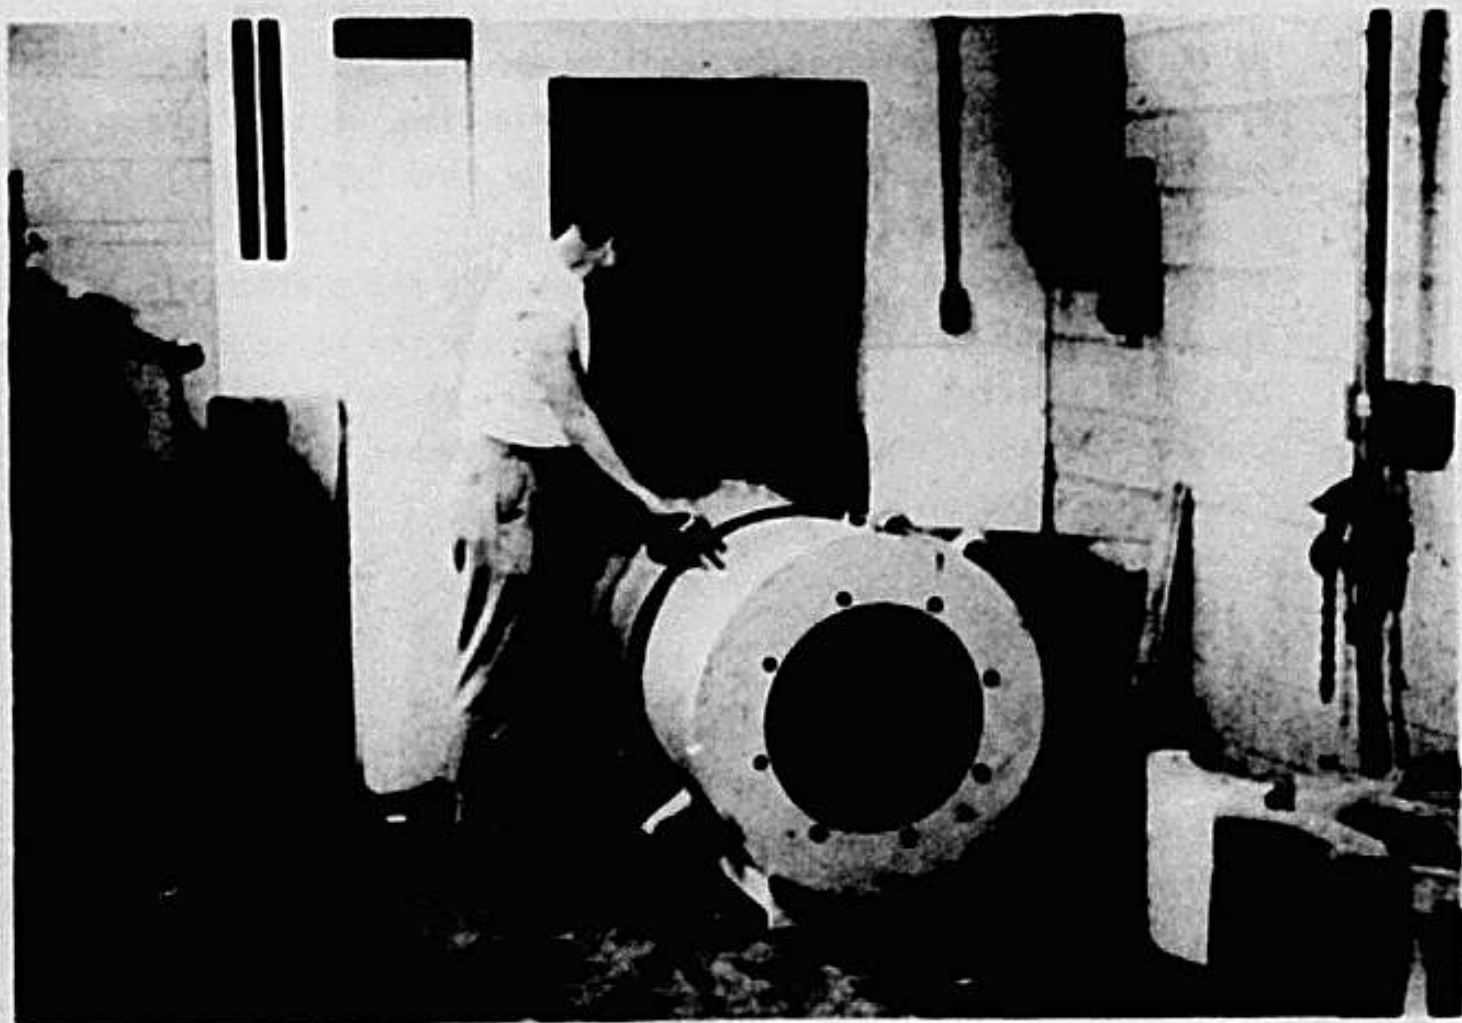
MINITUNNEL FULLY ASSEMBLED AND IN HORIZONTAL POSITION READY FOR TESTING
